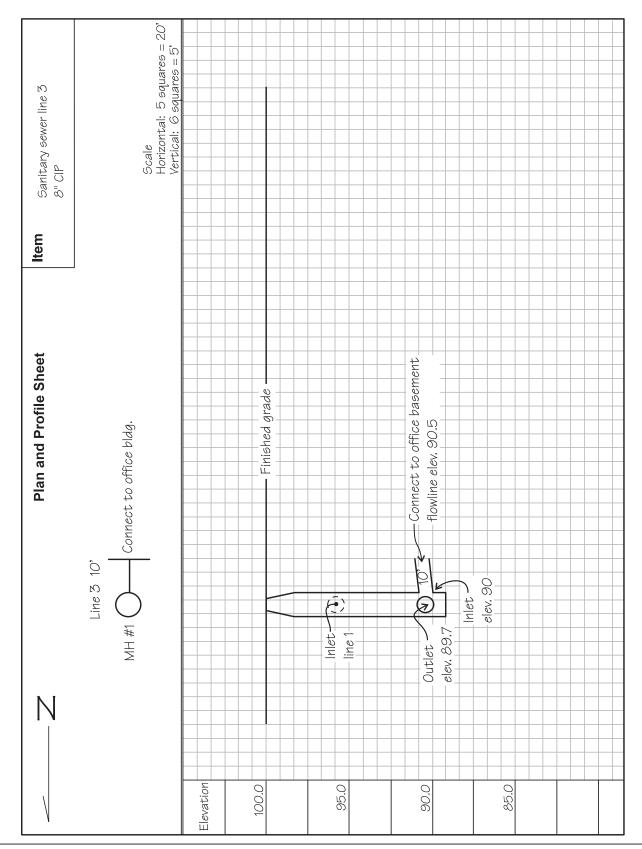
Sanitary sewer line 3, plan and profile sheet
